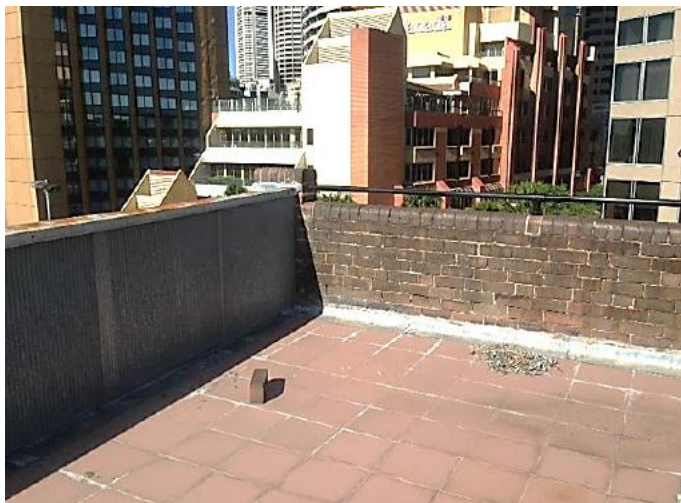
Open root terrace and Laundry (A1) external door to rooftop from laundry, chimneys and terrace, 117A Gloucester Street, 2016. Source: Sydney Harbour Foreshore Authority, M Stacy
